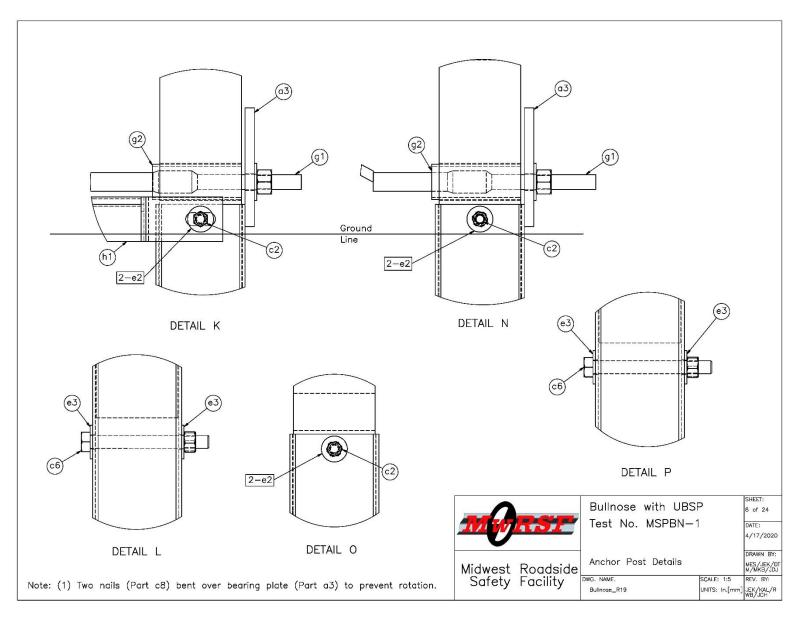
Anchor Post Details, Test Nos. MSPBN-1 through MSPBN-3
